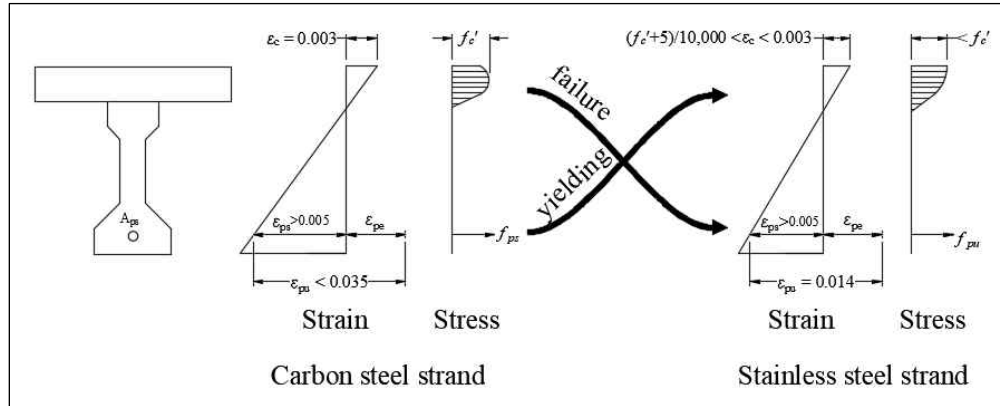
Design of carbon and stainless steel prestressed concrete girders
